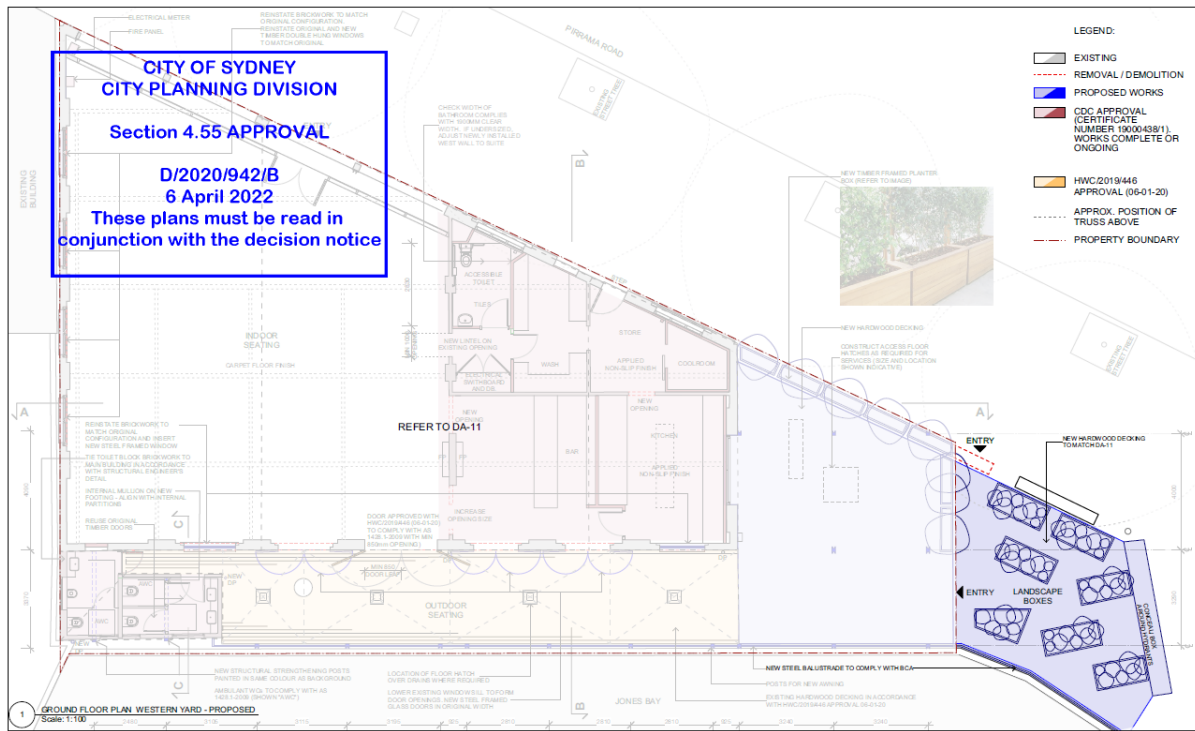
Extract of approved plan granted under D/2020/942, with the portion of the site located on 26-28 Pirrama Road shaded purple. This portion of the outdoor area contains landscape boxes which limits the useability of this area.
